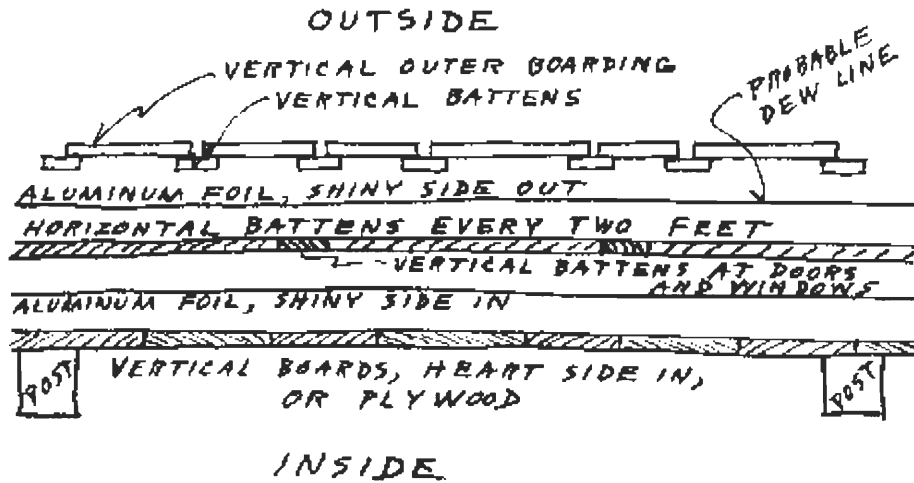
Cross-section of an outside wall. (Roberts, 141)
